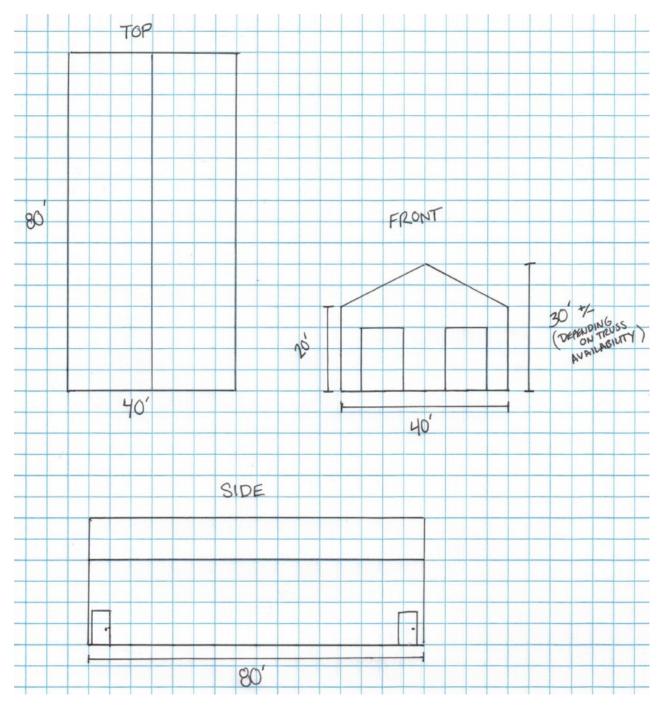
Drawn elevation of the proposed barn at 9621 E 96th Street.
